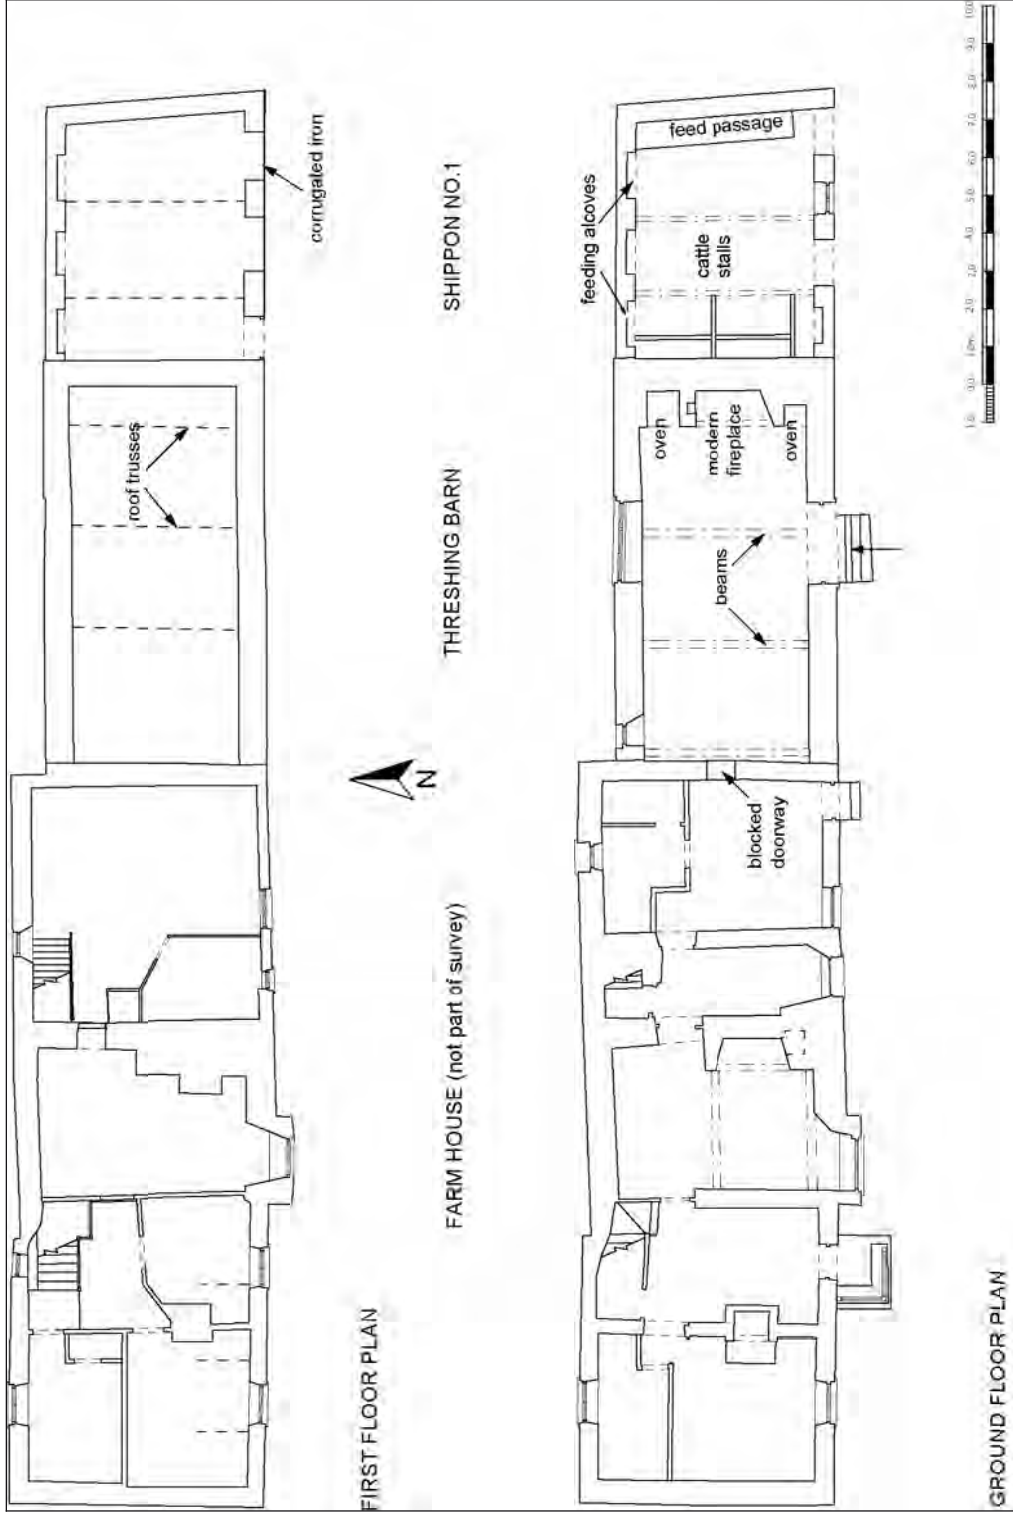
Plans of the Threshing Barn and Shippon No. 1.
